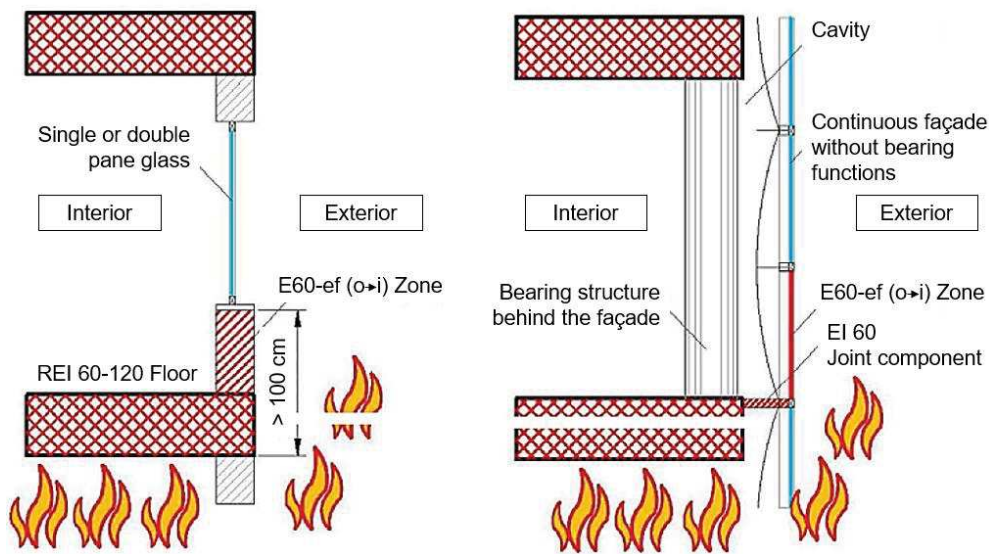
Examples of façade detailing for a simple façade (left) and a continuous façade solution (right) - CVVF.
